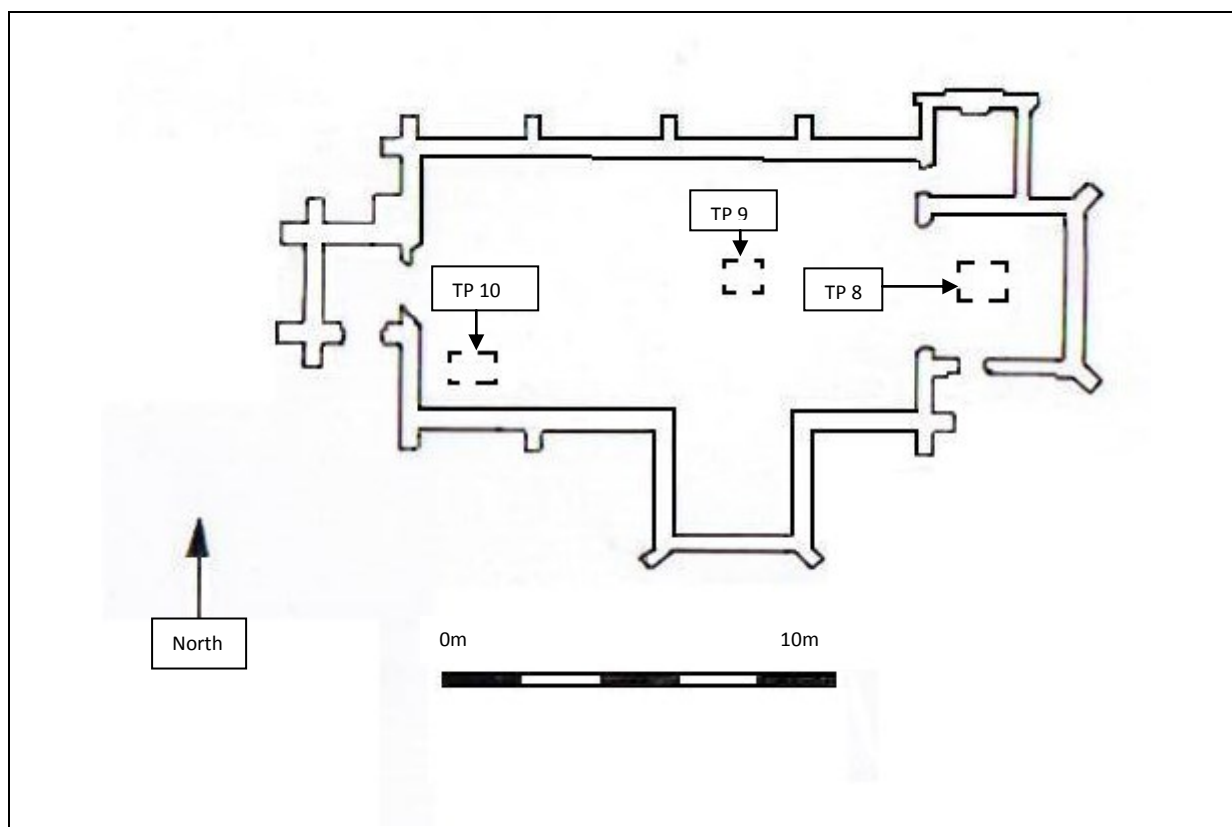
Location of Test Pits 8-10, St Andrew's Church, Thursby
